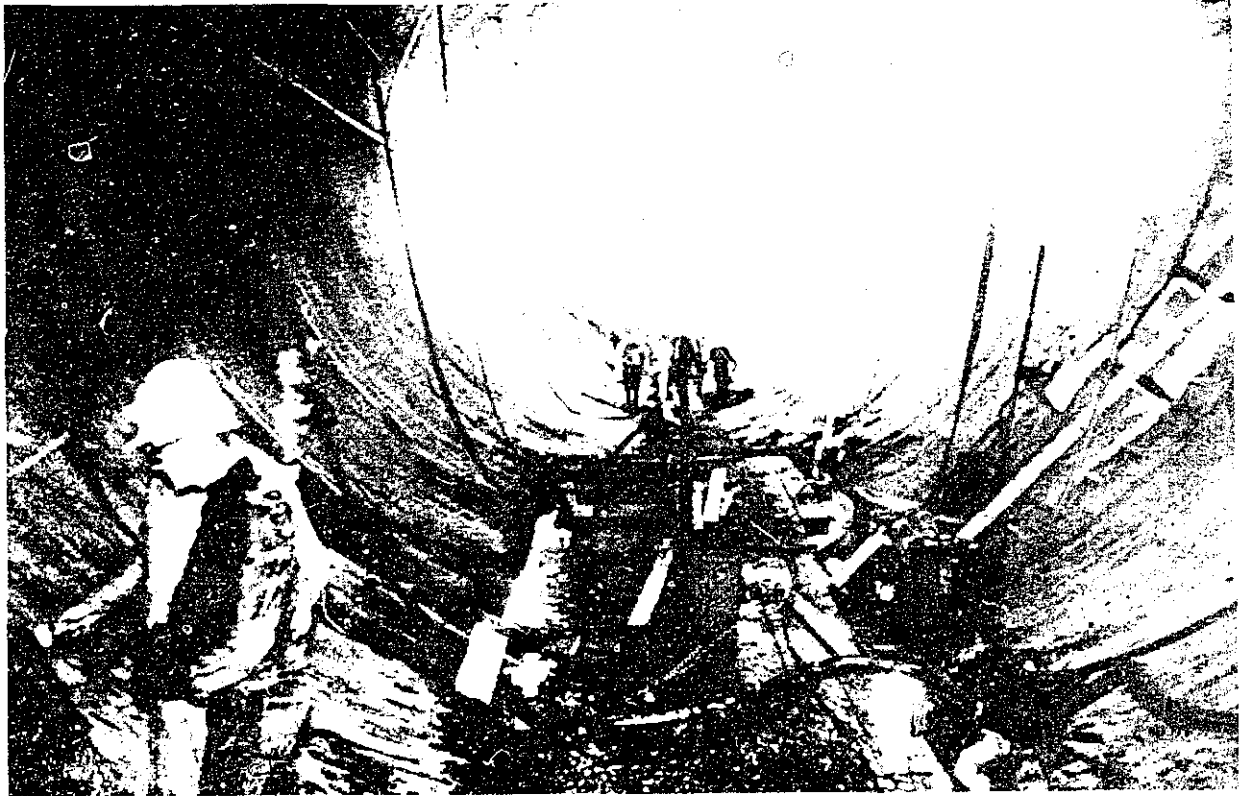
Overall view is shown of work area in spillway tunnel looking downstream from approximately the P.T. station of the elbow. Bonded concrete repairs have been completed; epoxy repairs are underway. Photo P459-D-68814
